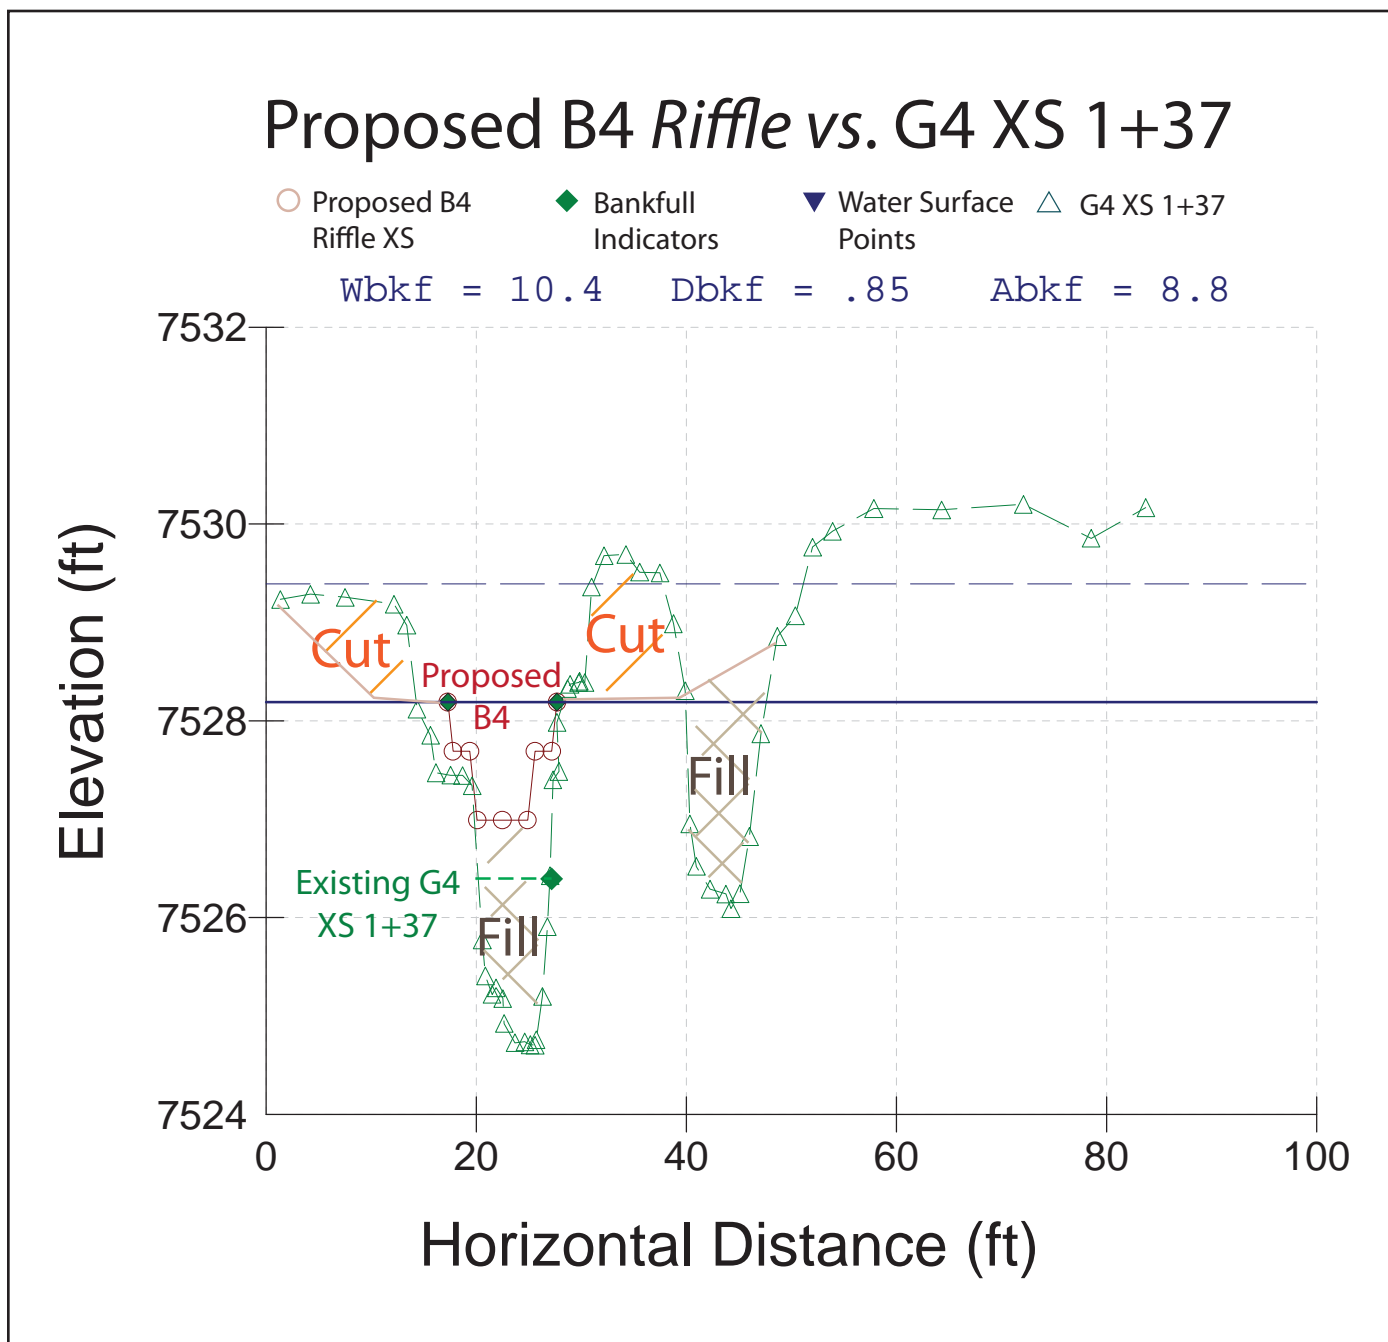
The proposed B4 *riffle* cross-section compared to the existing G4 cross-section 1+37, indicating the cut and fill requirements and new bankfull elevation.
